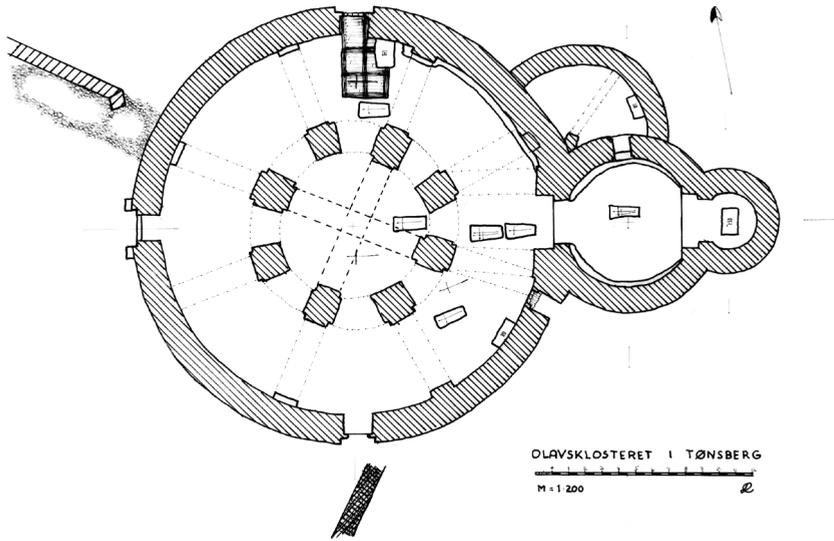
Church-plan with arches for the vaulting. Illustration: Ø. Lunde.
